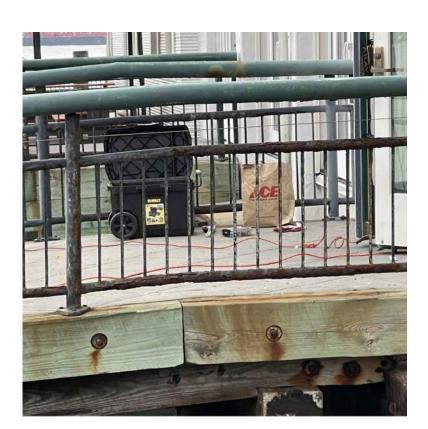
OPEN AREA #6 CORRODED HANDRAIL
